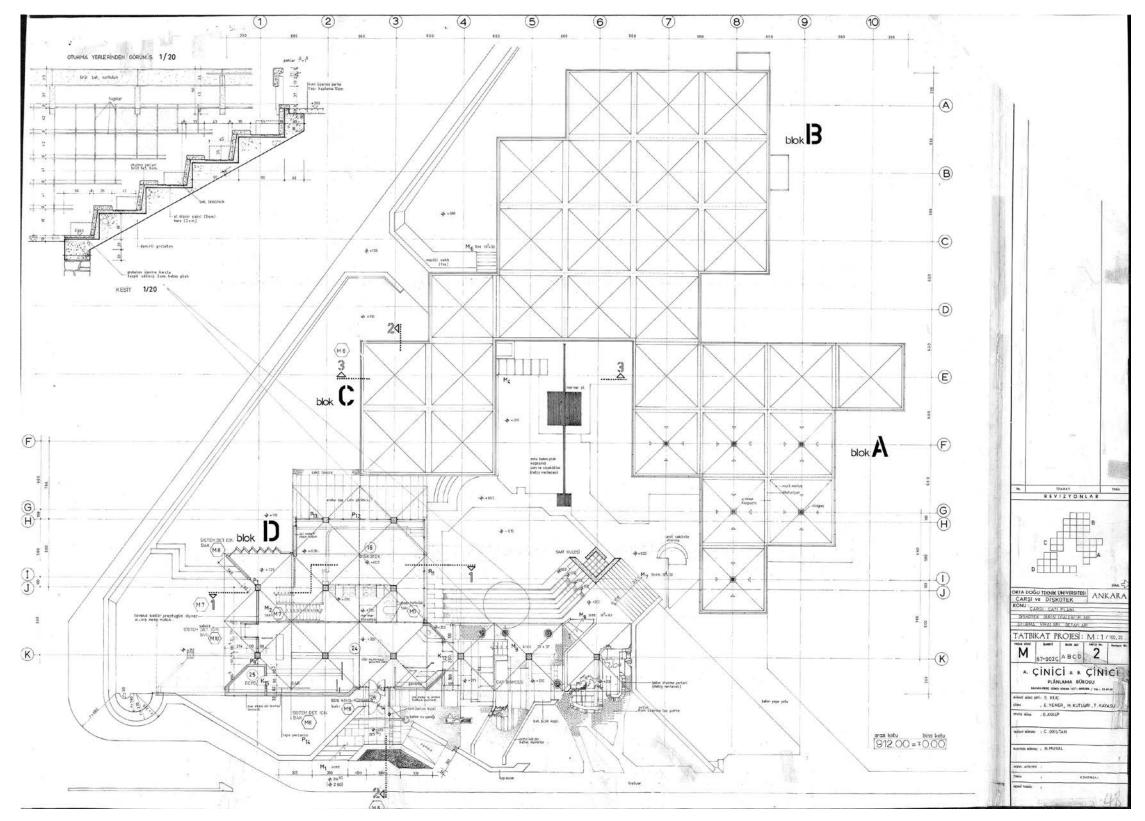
Original Drawing; *Çarşı* Roof Plan, Discotheque Entrance (Gallery) Plan, Auditorium Details Source: METU Directorate of Construction & Technical Works
